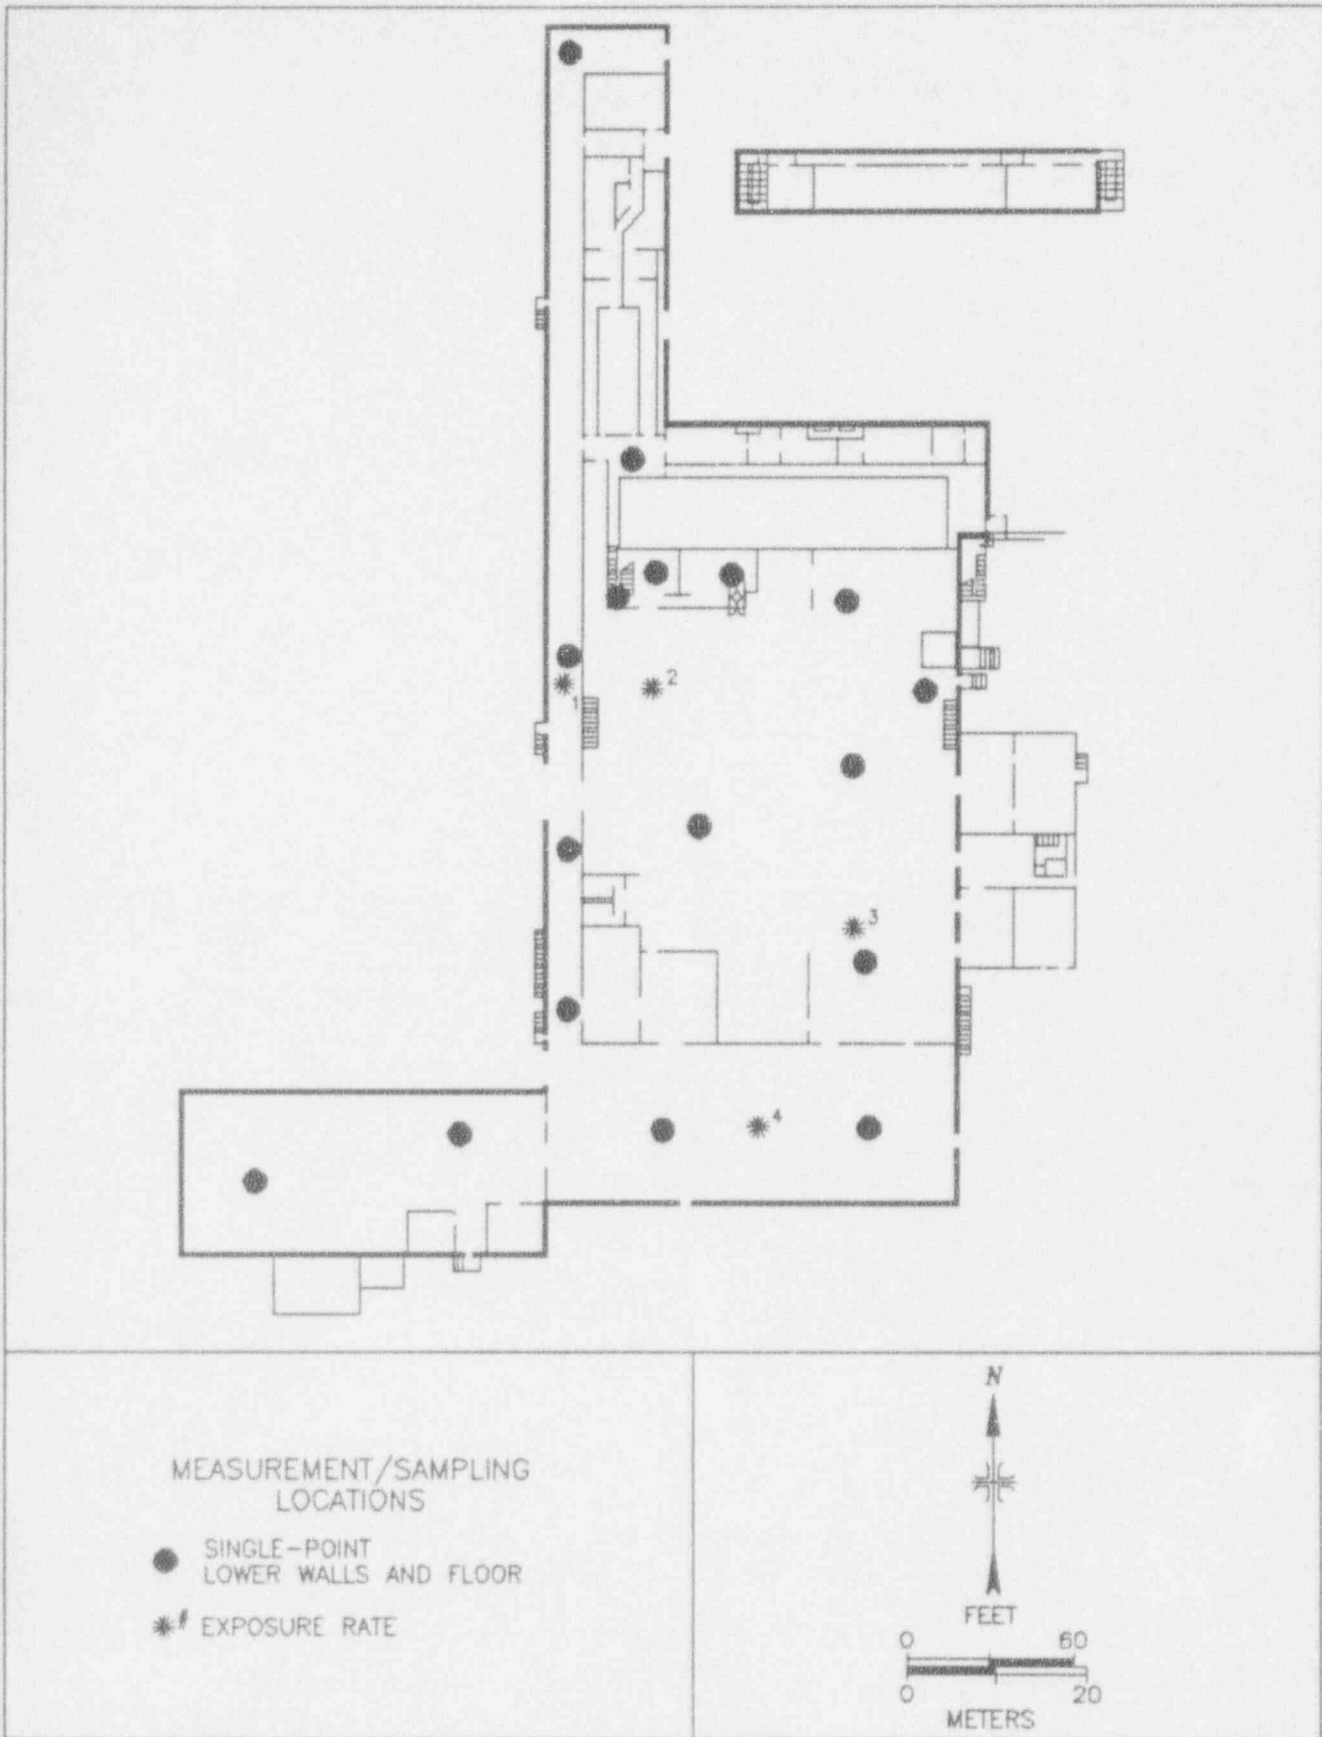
Building L, Main Floor – Measurement and Sampling Locations
